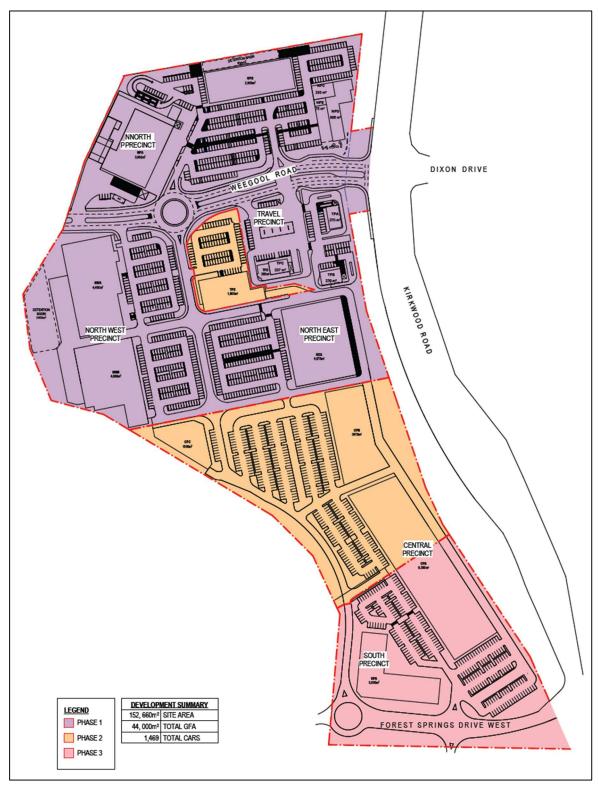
Proposed Phasing Plan (Source: ThomsonAdsett, 2025)
